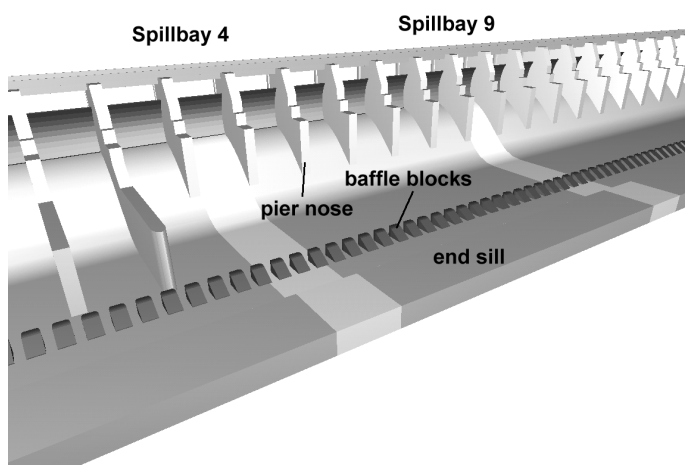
Overview of The Dalles Dam spillways looking upstream.
